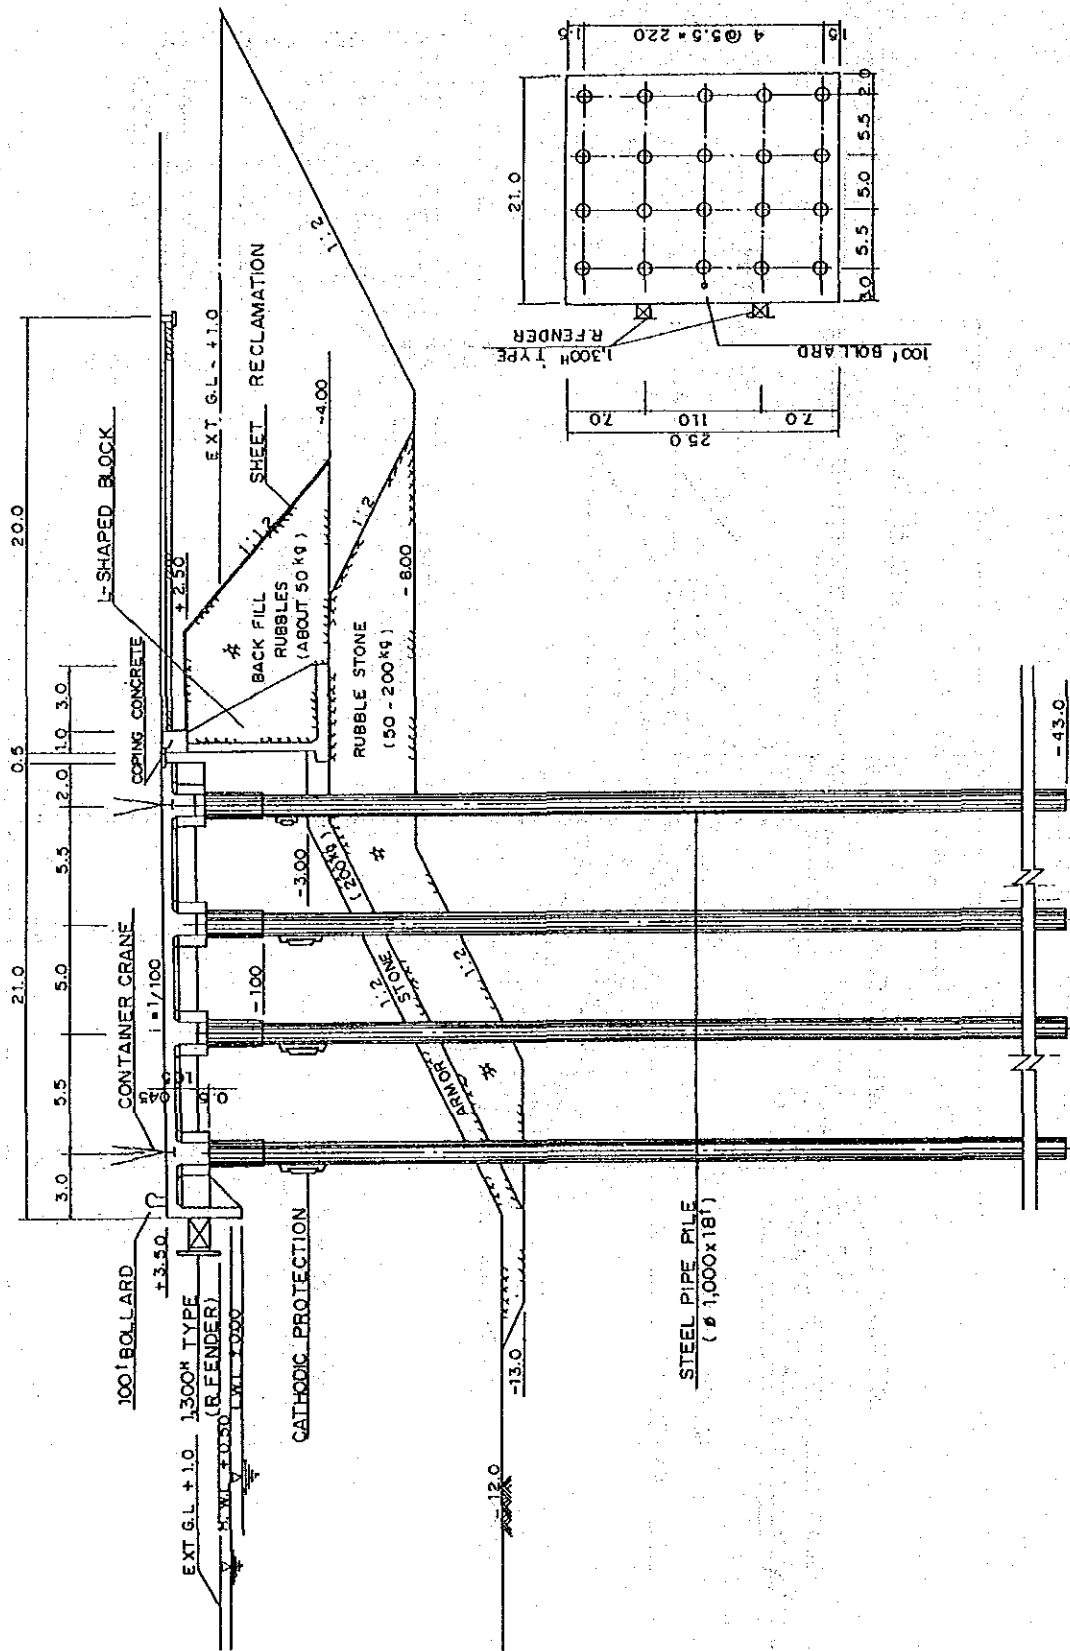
(A-j) ⑦ -1 GENERAL CARGO BERTH (-12.0) (PLAN A) (Unit; m)
